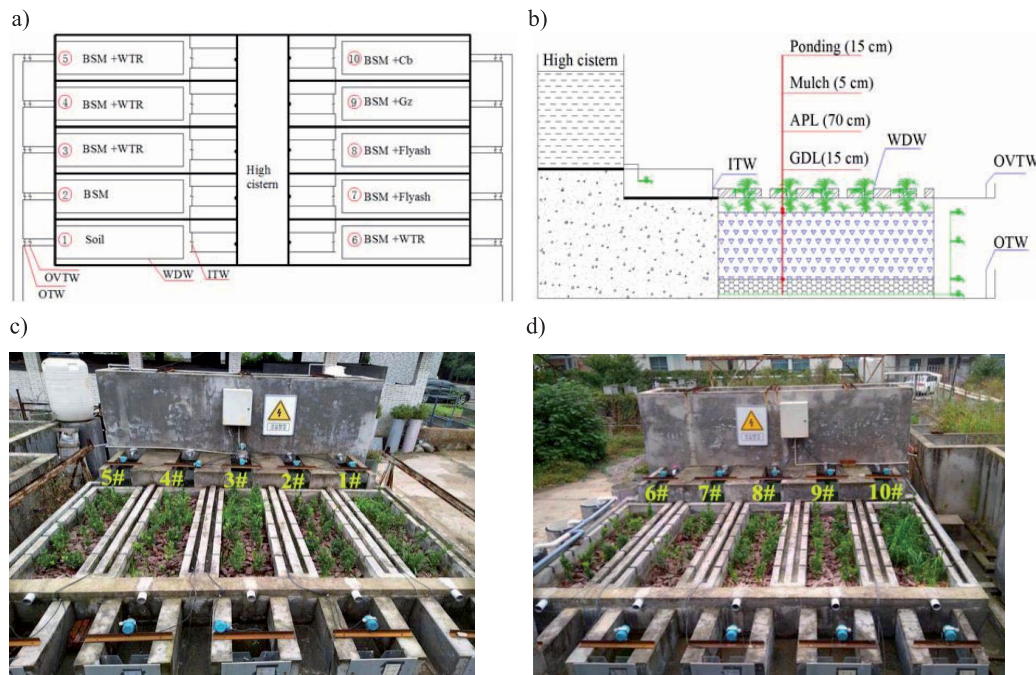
Pilot plant structure and site photos: a) Floor plan, b) Sectional view, c) 1#~5#, d) 6#~10#.
